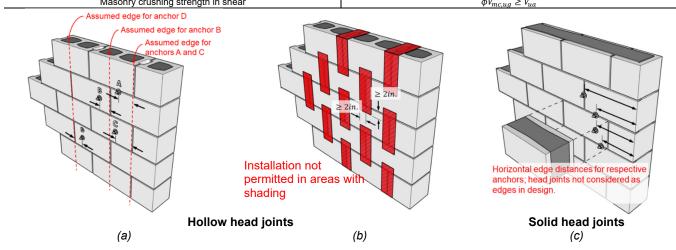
(a) Edge distance considerations in fully grouted CMU construction with hollow head joints, (b) exclusion zones in fully grouted construction with hollow head joints, and (c) edge distance considerations in fully grouted CMU construction with solid head joints. Note: dimensions to upper and lower edges omitted for clarity.
